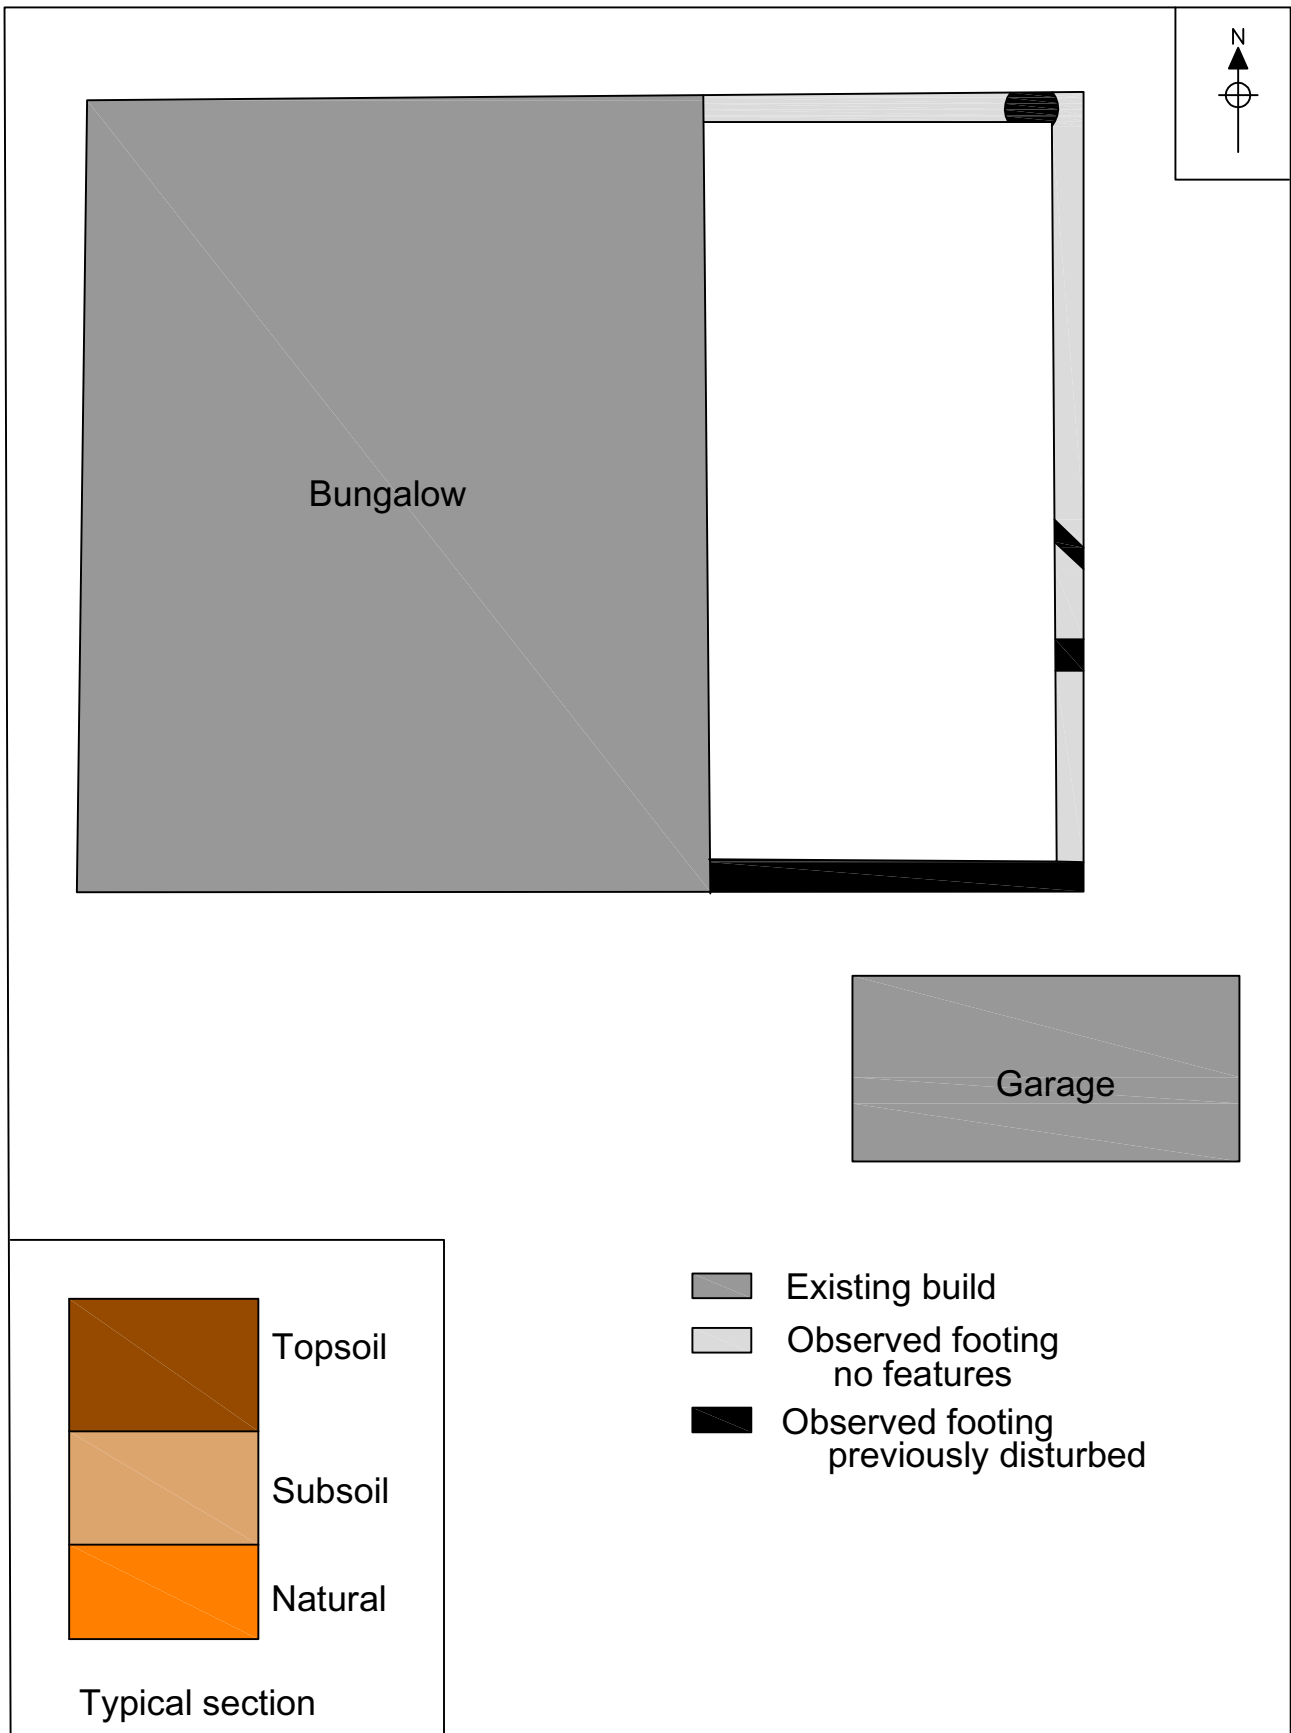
Showing plan of footings (Scale 1:100) and typical section (Scale 1:20).
